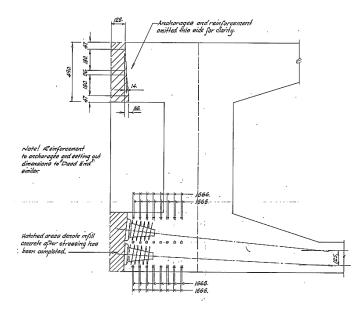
Plan view of end anchorage (Extract from Record Drawing ER6D/S73/7)
